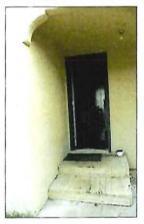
2715; View: Rear Entry. R. 100_2714; View: Rear Entry door (new); Photo Date: Sept, 2020; Camera Facing: NE.
